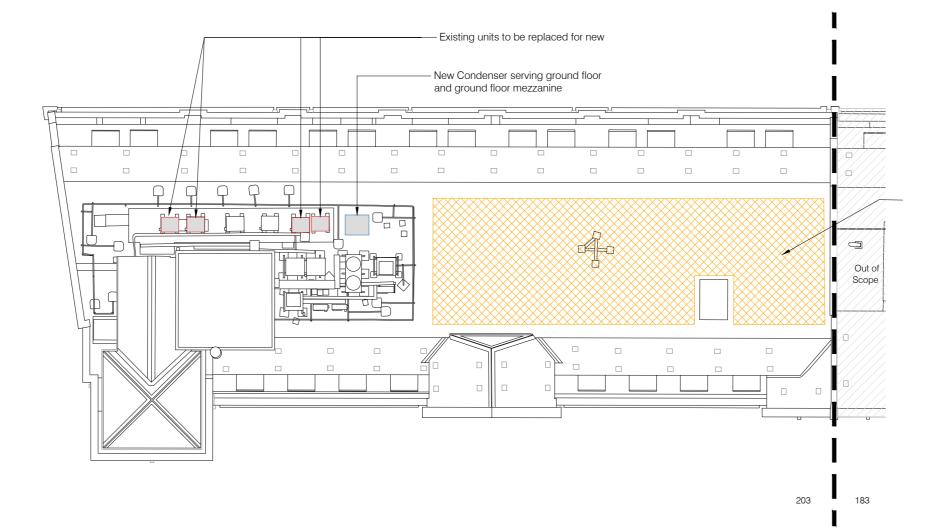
Proposed condenser plant services to roof of 203 (PV panels will be submitted in a separate application)
